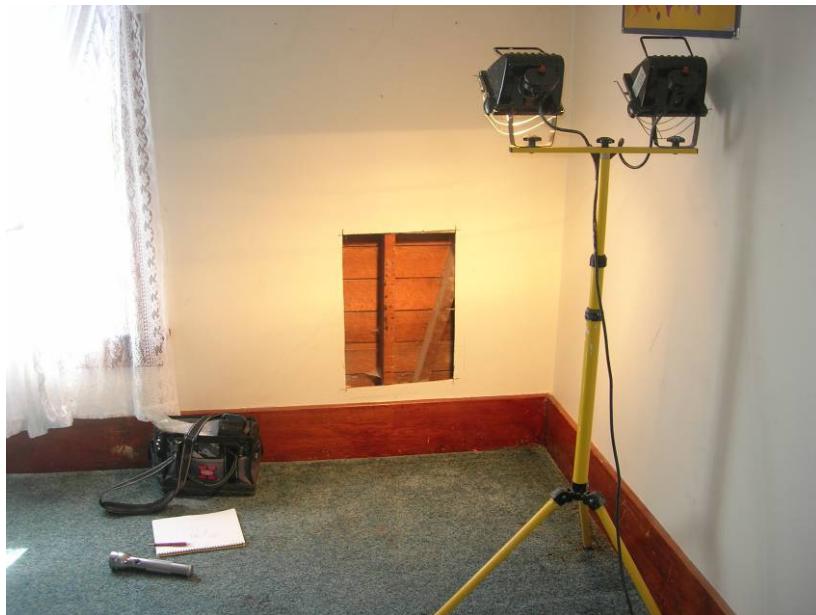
Smith House, Opening No. 1. Upstairs bedroom, north exterior wall.
